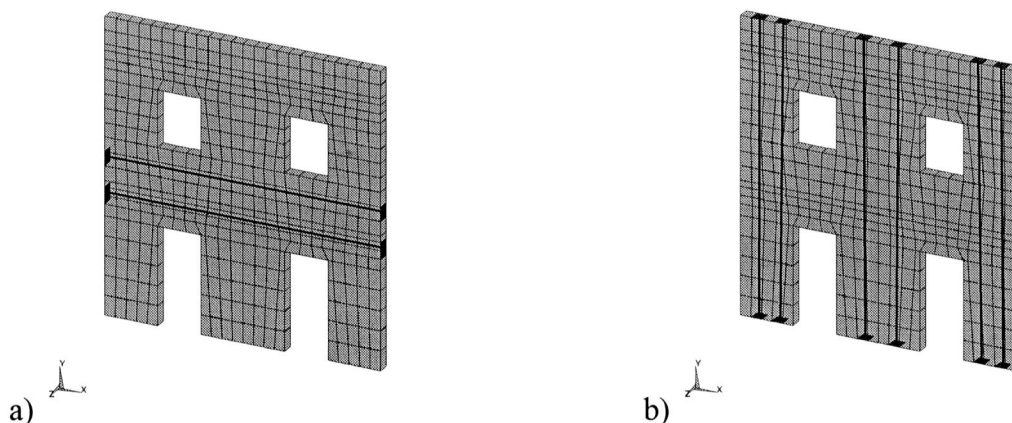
Truss and plate elements for the modeling of horizontal and vertical tie bars
